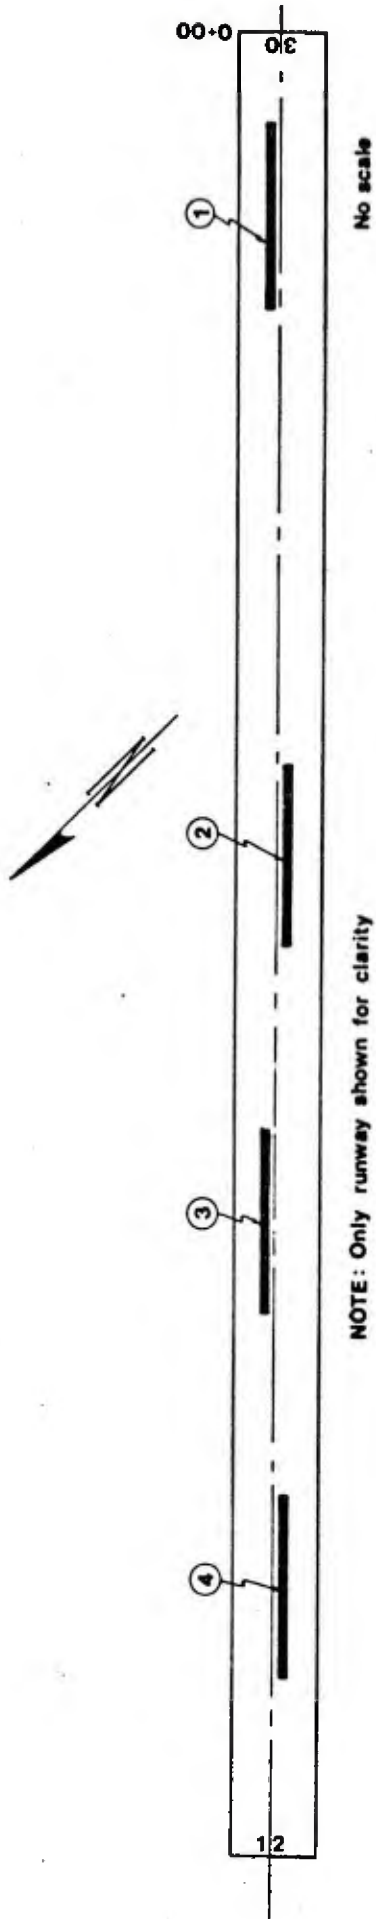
Typical longitudinal joint cracks. Discrete Area R12-1
